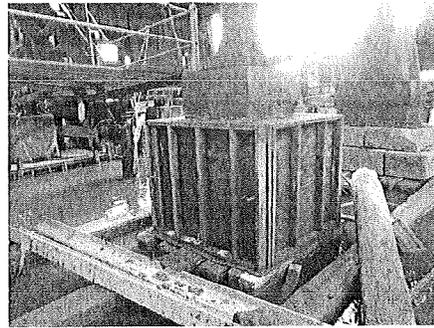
Pedestal # 14, encased in concrete with forms left in place, grillage in poor condition and heavy debris looking southeast.
